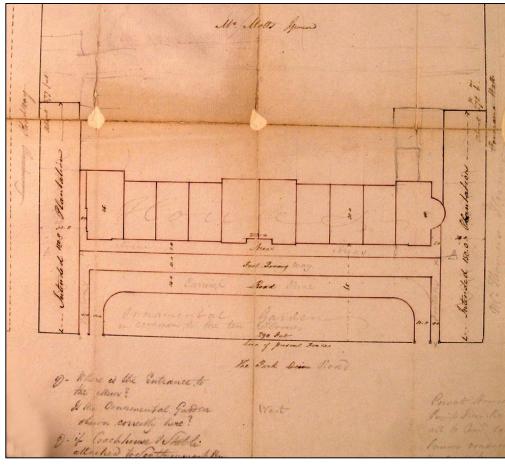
Sketch plan of Cambridge Terrace 1825 from John Nash's Office (TNA MP 1/585)
